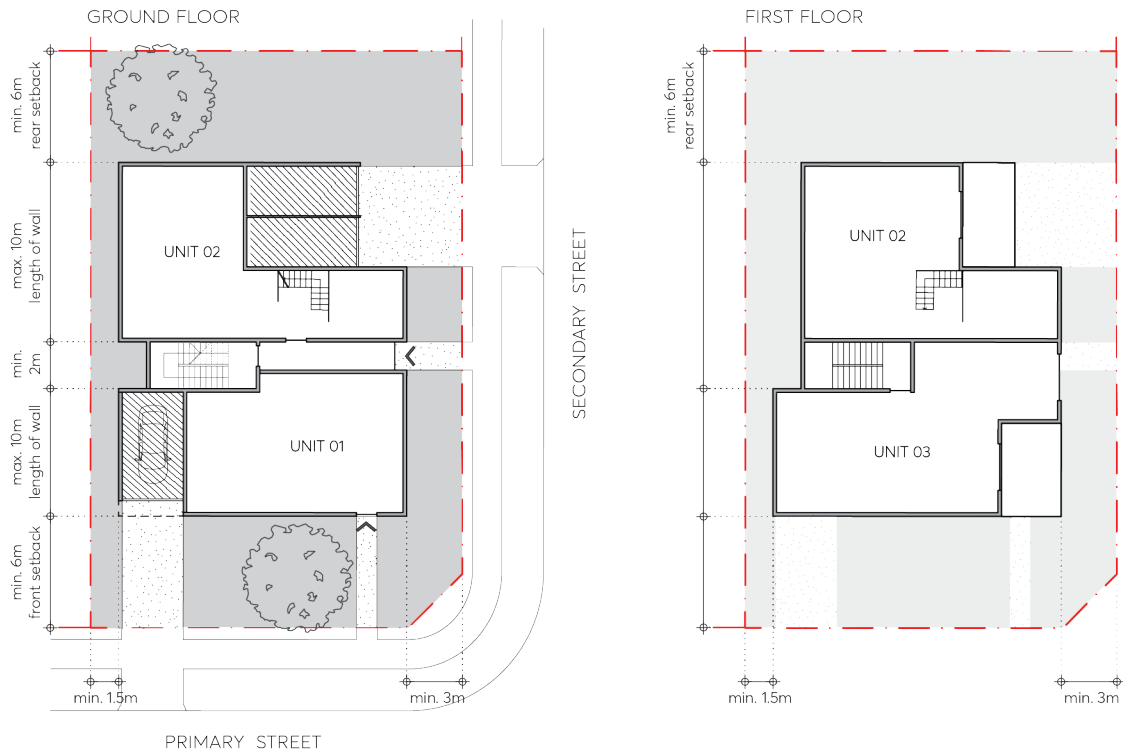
Site setbacks for manor houses on a corner lot
